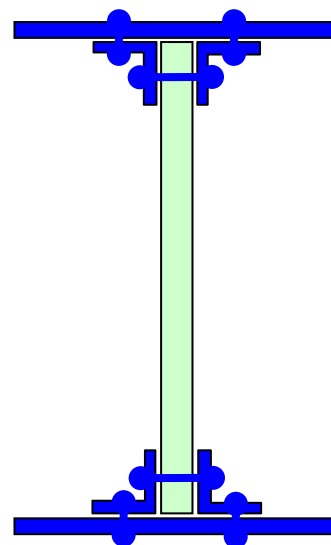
, Cross-section of glass-steel composite beam. The flanges are steel (blue), the web is glass (light green).
